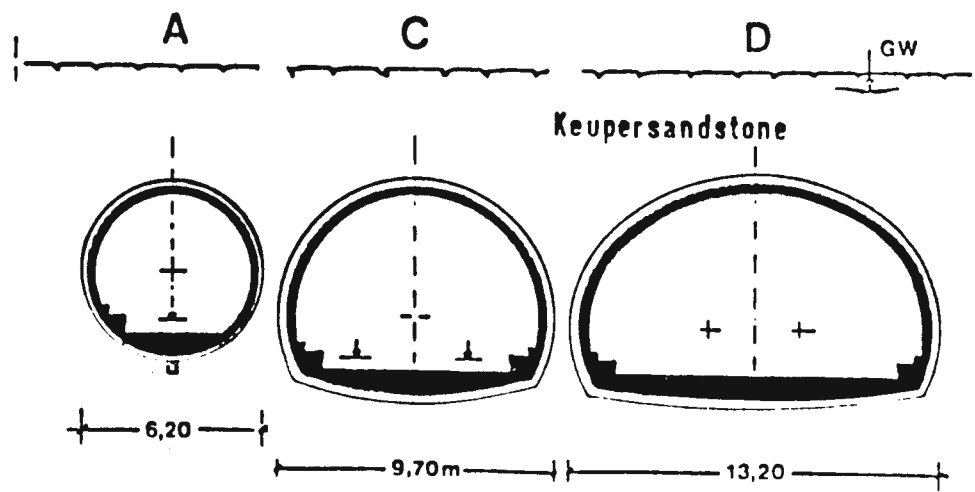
Cross sections of subway tunnels in soft Keuper sandstone at Nuremberg.
